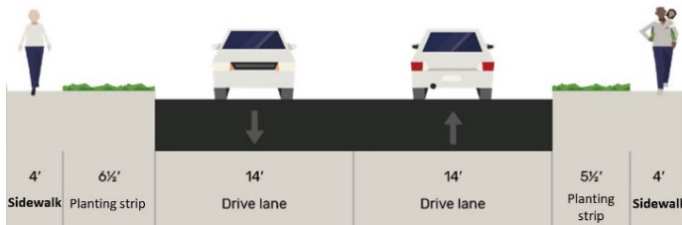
Section E (SE Adams St to SE 17th St) – Existing (28' curb to curb)
